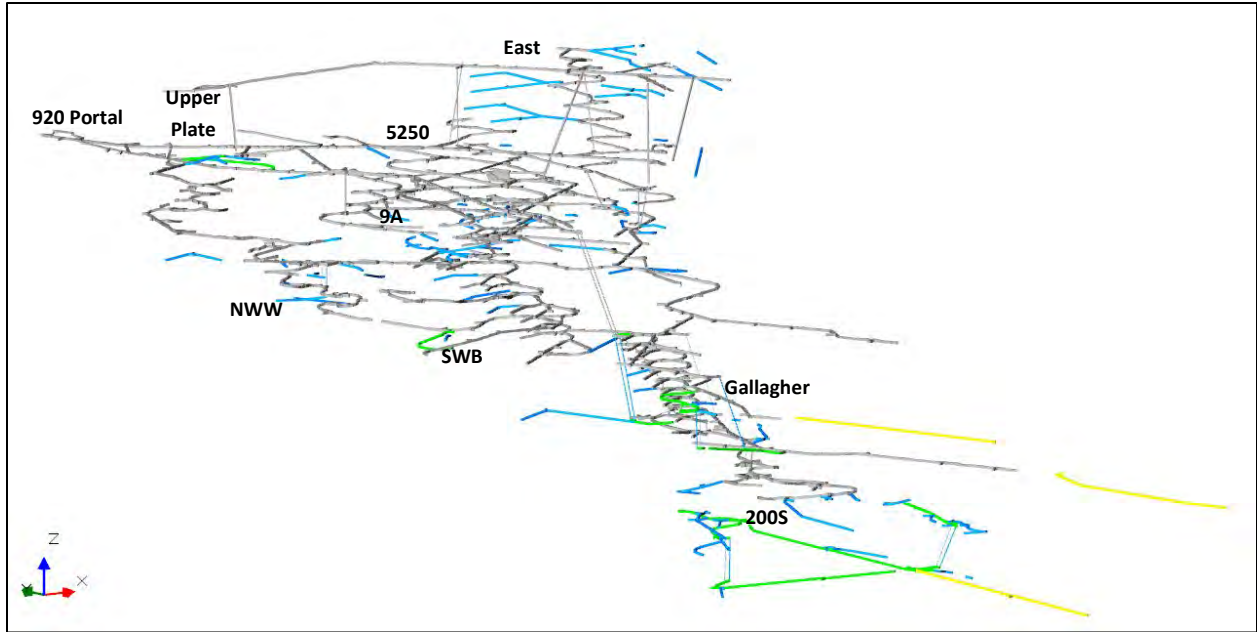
Plan View- Existing and Planned Primary Mine Development through 2032
